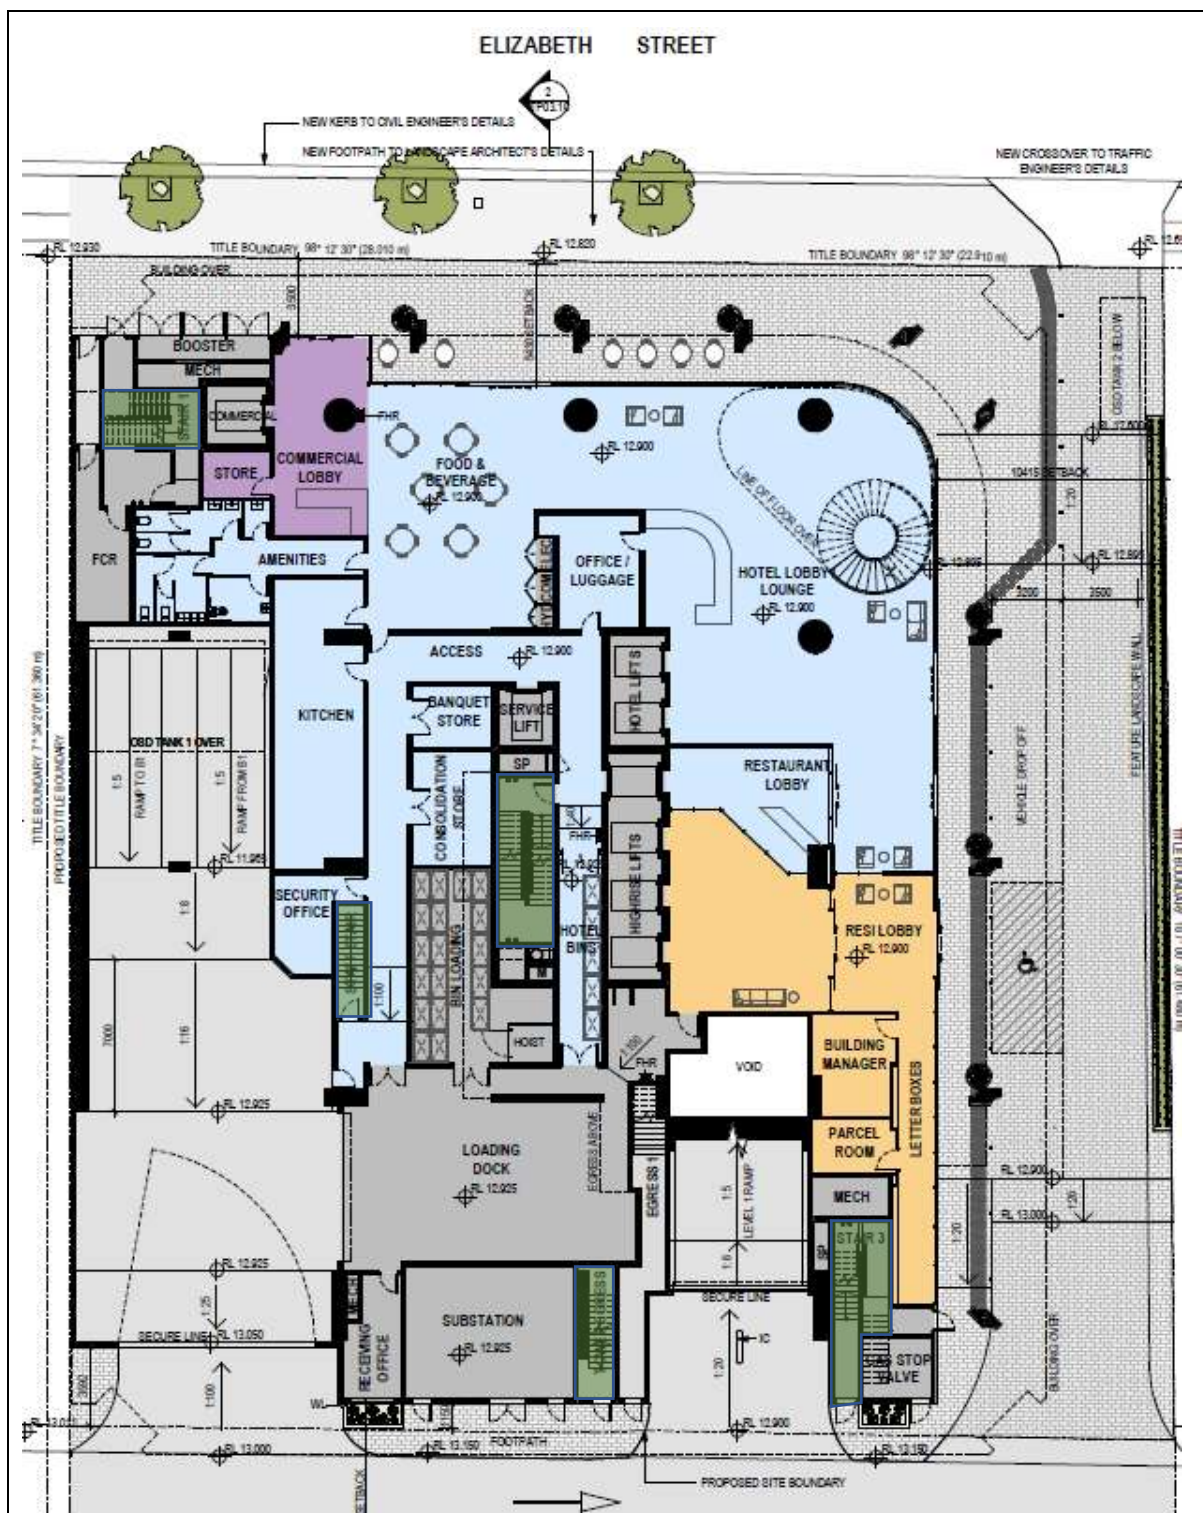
Extract from Ground Floor Plan. Fire stairs marked in dark green.
